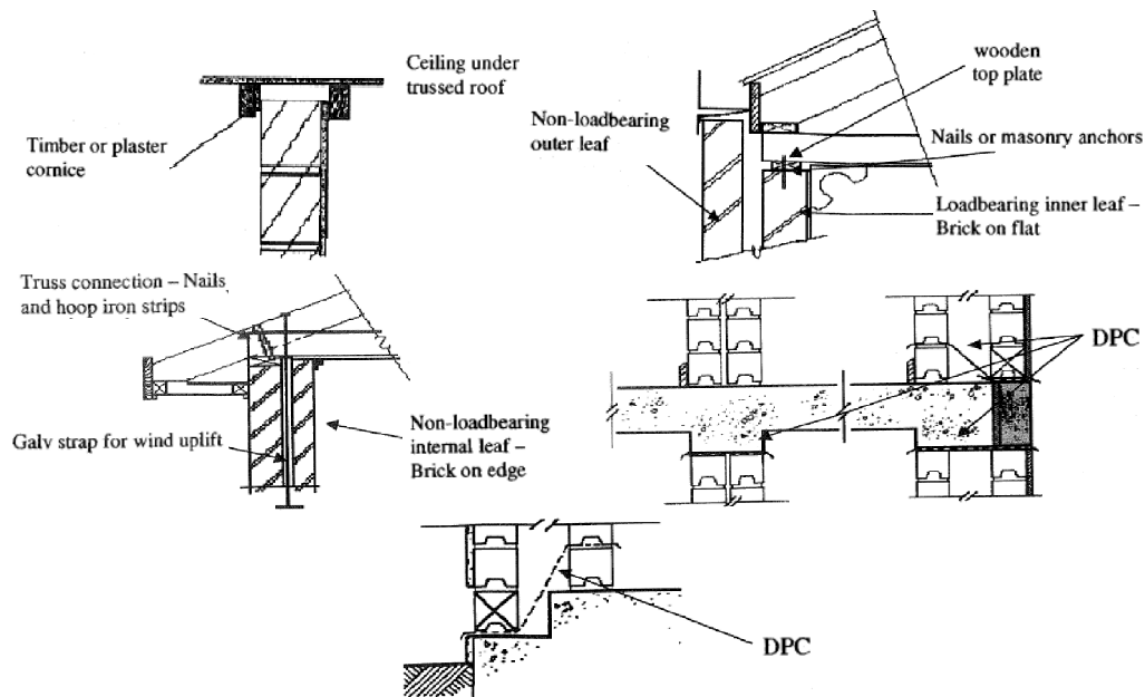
Typical connections between wall-diaphragms (adapted from [2])
